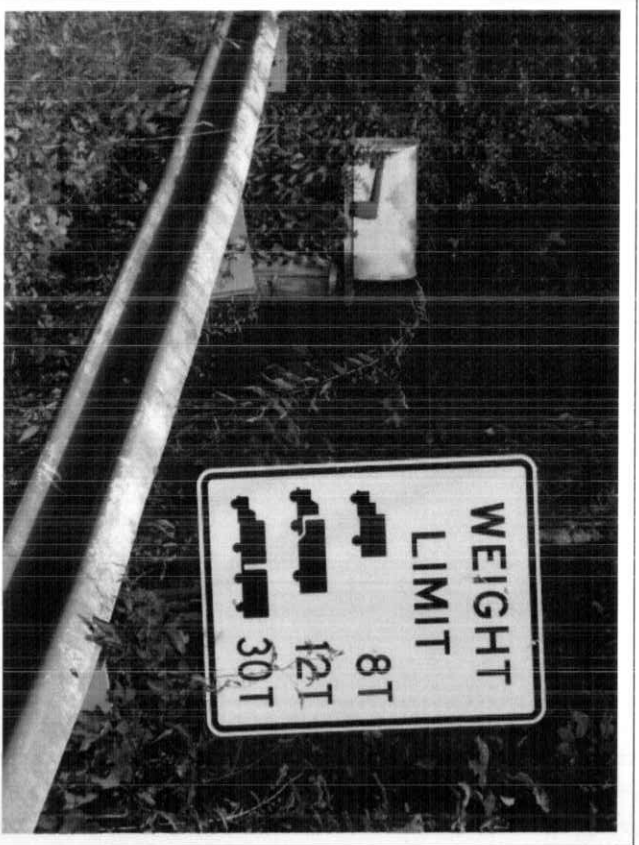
WARNING SIGN EAST OF STRUCTURE.
